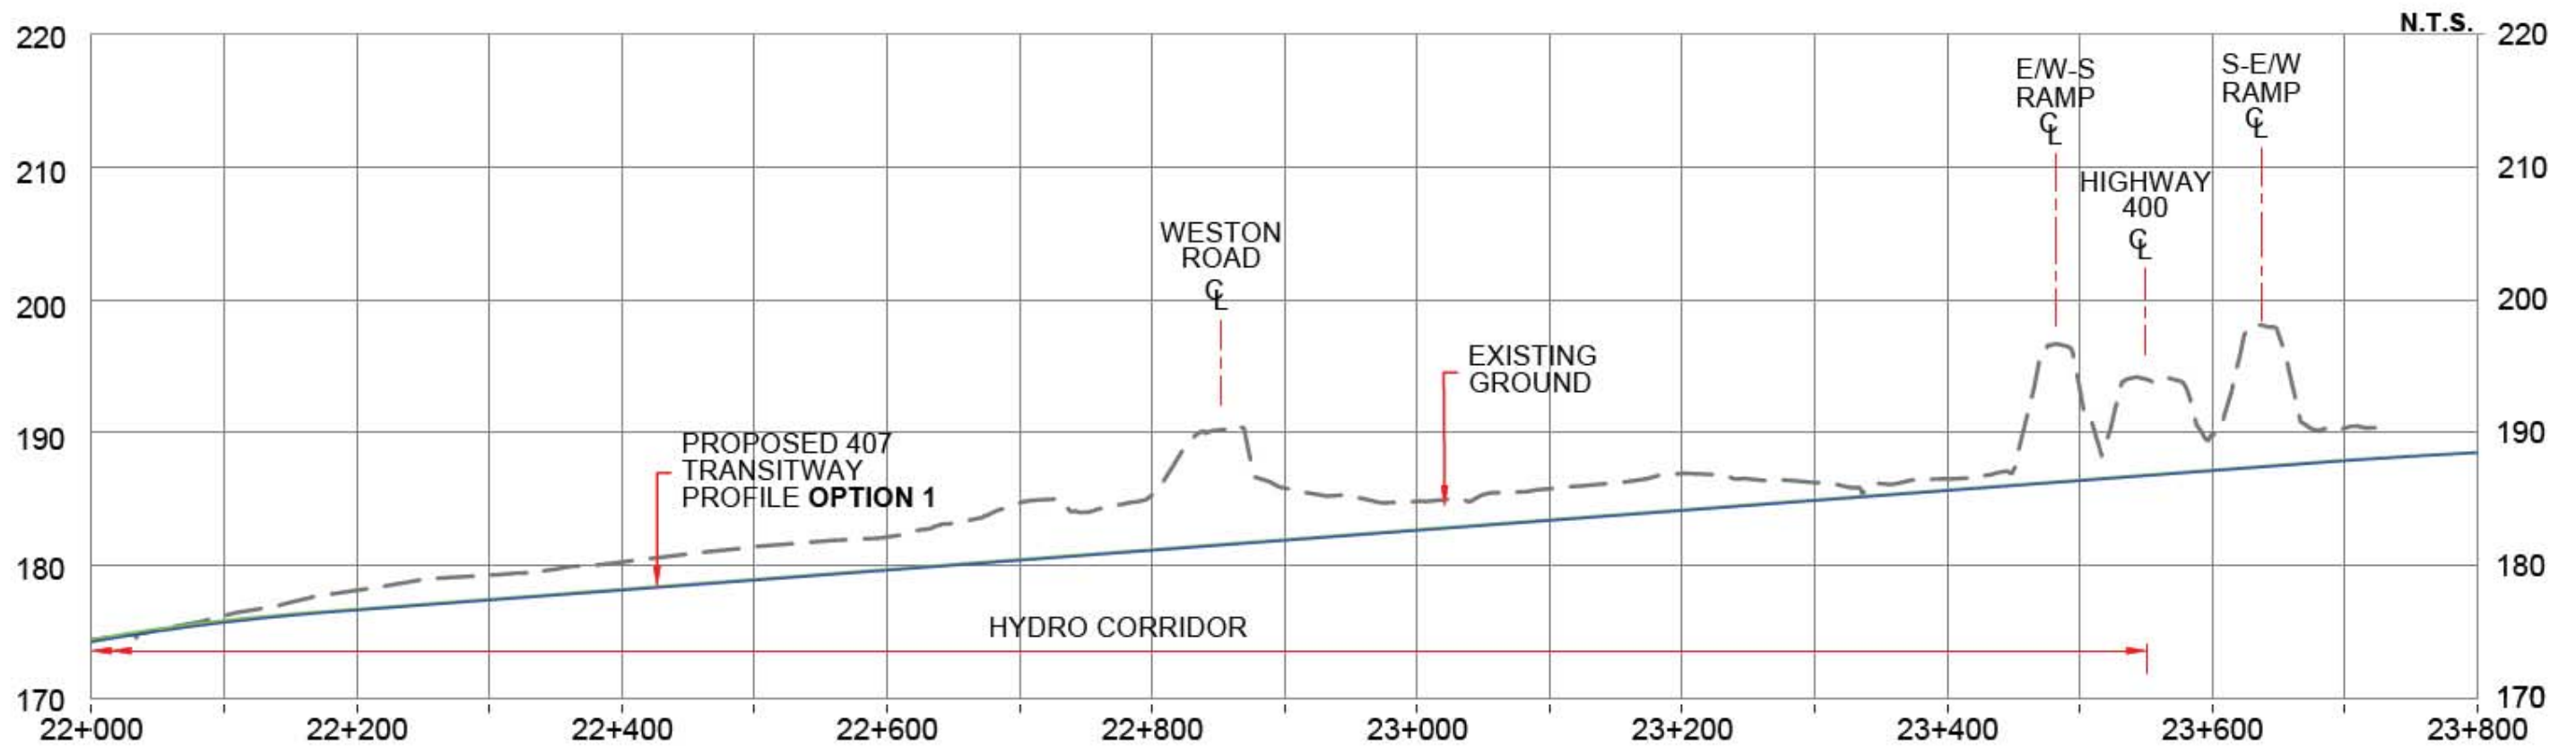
C: SEGMENT H.2, WEST OF ISLINGTON AVENUE TO EAST OF HIGHWAY 400– WESTON ROAD/HIGHWAY 400 AREA
